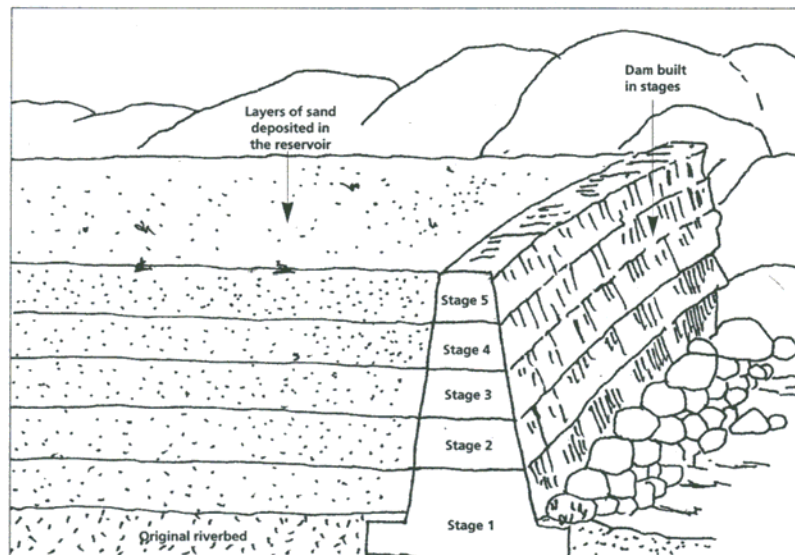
Typical stages of construction of sandfilled reservoir (Nilsson 1988)
